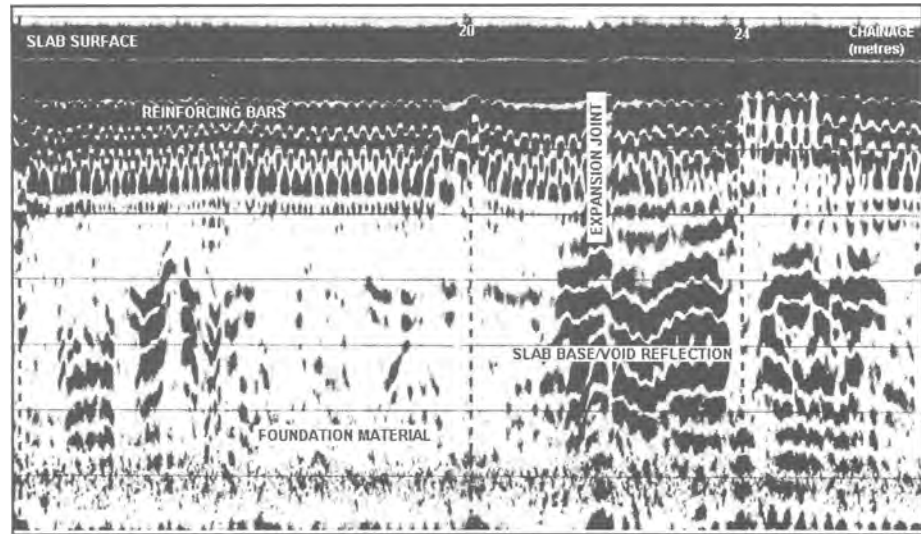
Subsurface radar survey record obtained from a reservoir floor slab (Structural Testing Services Ltd)
